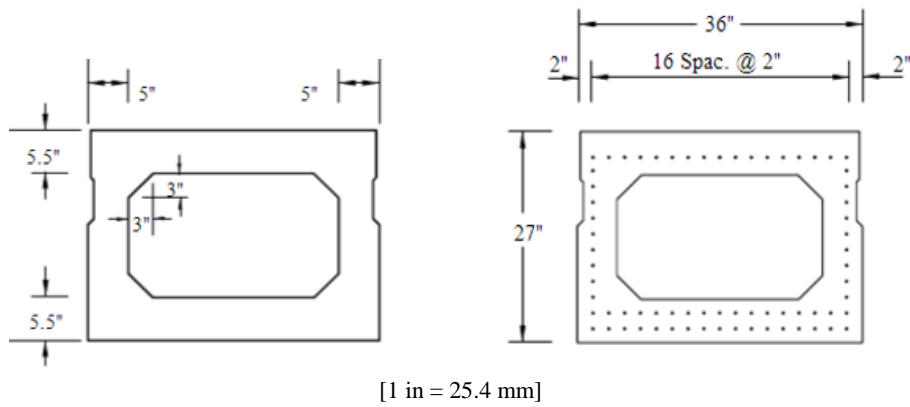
Standard AASHTO Type BI-36 box beam of Bridge 7722
